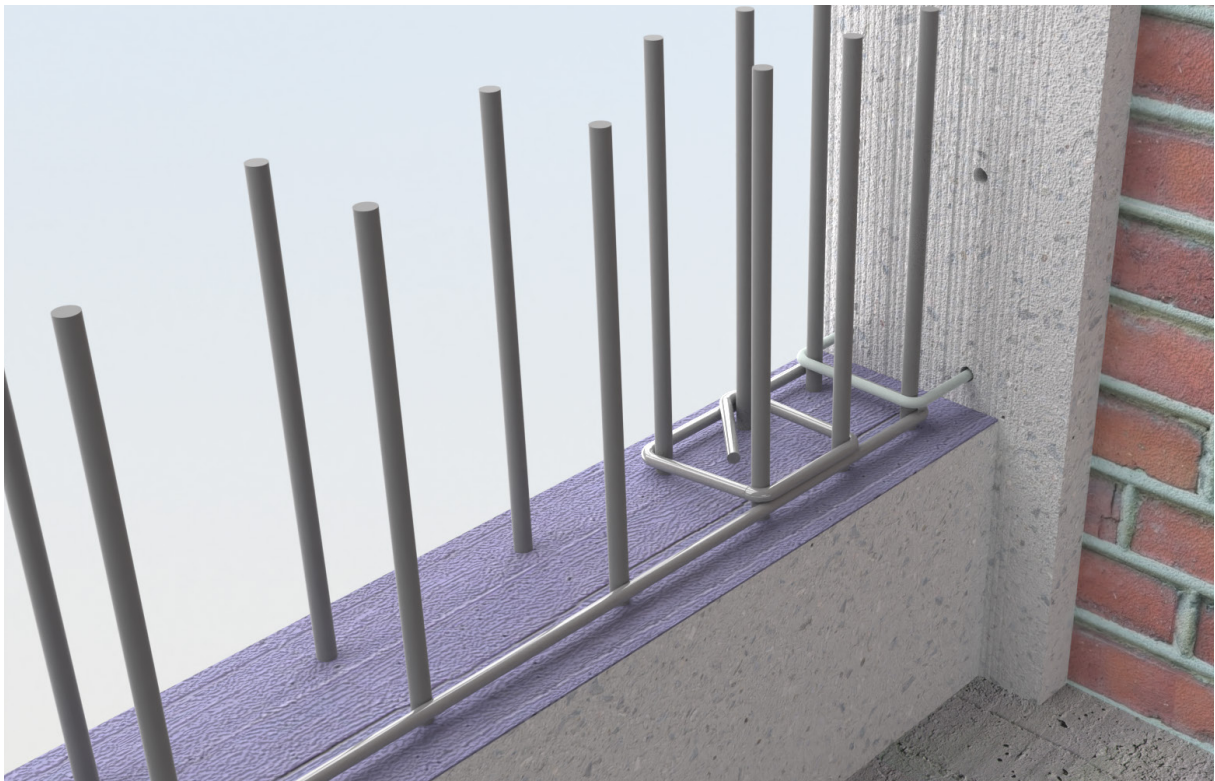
Step 5: After insertion of the longitudinal rebars, the timber formwork can be placed. It is deliberately chosen to use a timber formwork because of the larger and irregularity of the sizes of the formwork, making them out of steel would be less practical than just simply using timber ones.
